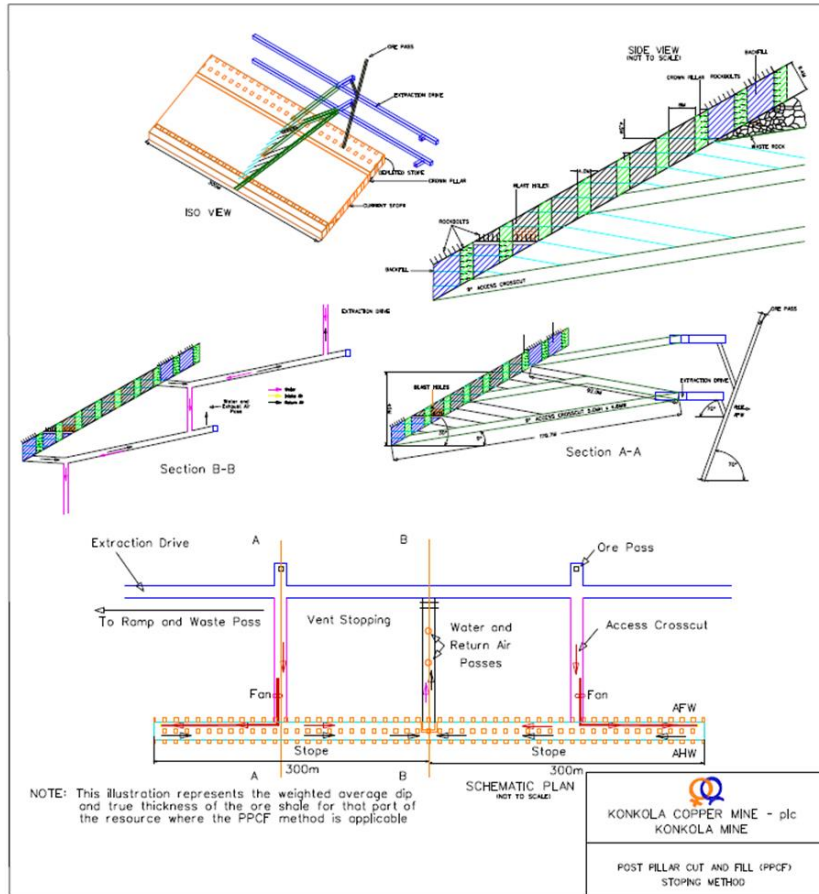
Post pillar cut and fill mining method used at Konkola Mine–
